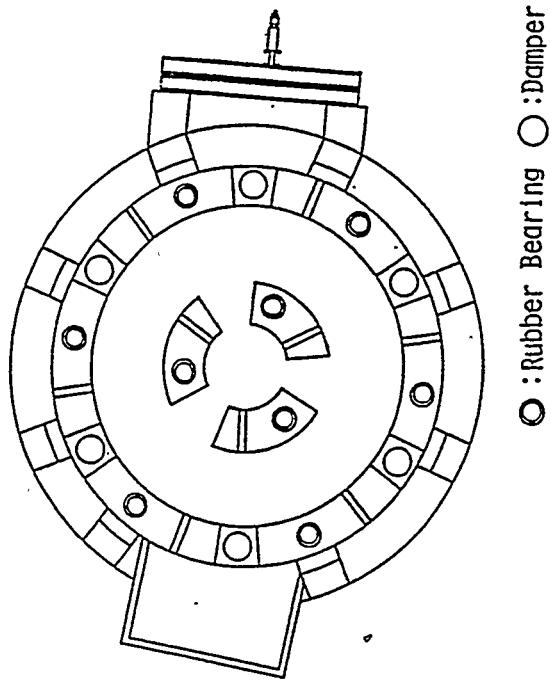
Plan of Test Model Showing Location of Isolators and Dampers
